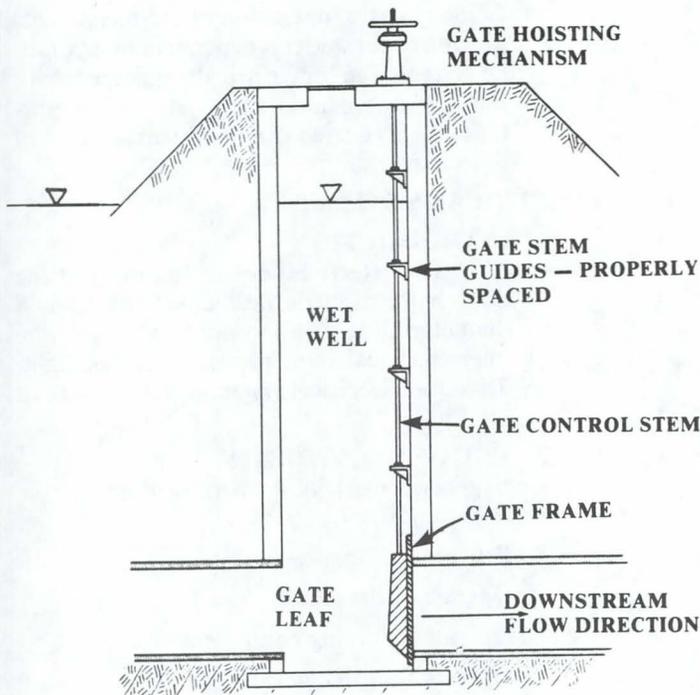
WET WELL OUTLET INSTALLATION
